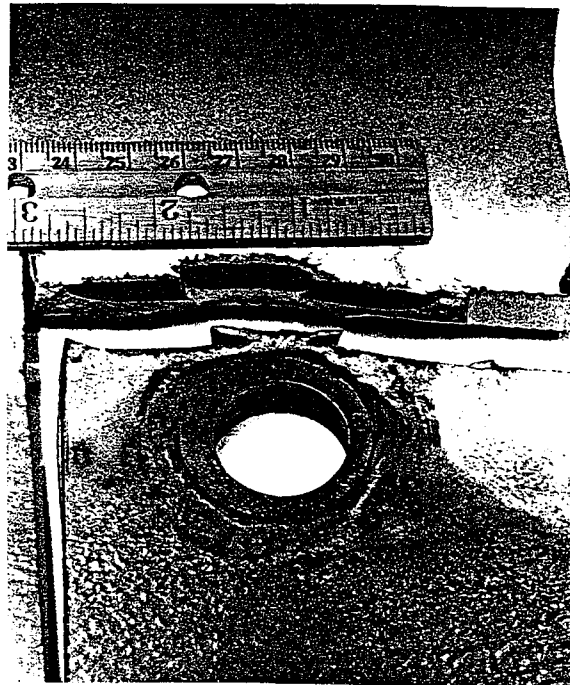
Fatigue Crack In Front of Bolt
